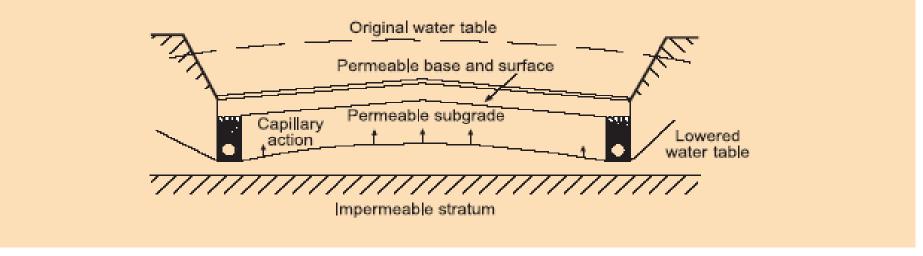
(c) Drainage trenches to lower water table (Gerke, 1987)
